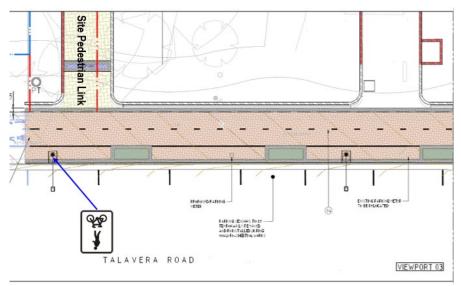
Proposed Shared User Path Sign along Talavera Road
